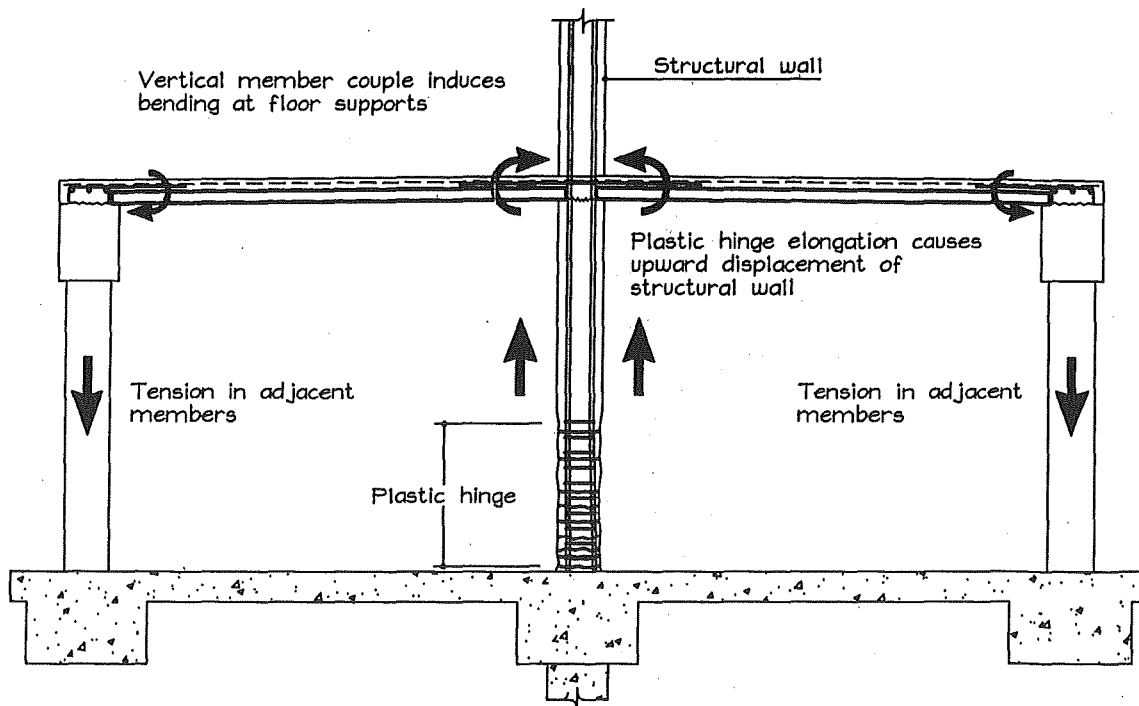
Coupling of the floor elements due to elongation of shear walls
